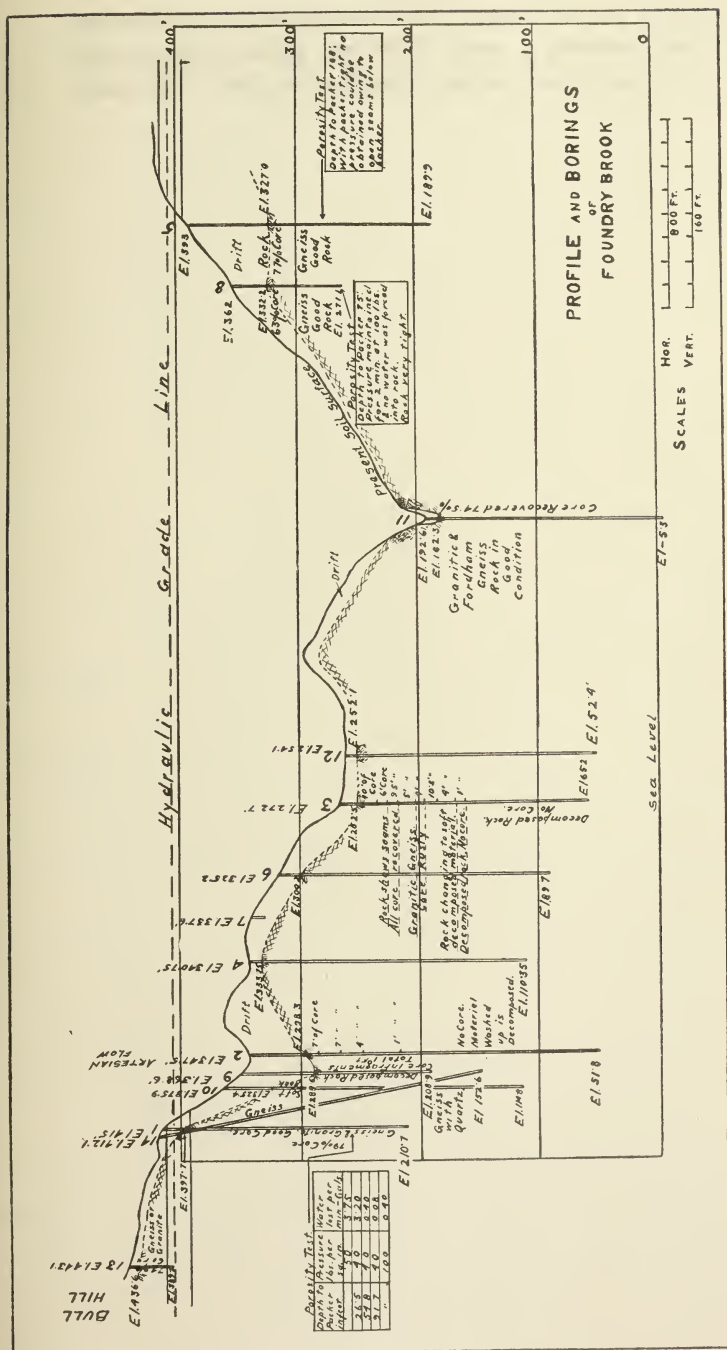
Structural detail of Foundry brook valley as indicated by borings.
